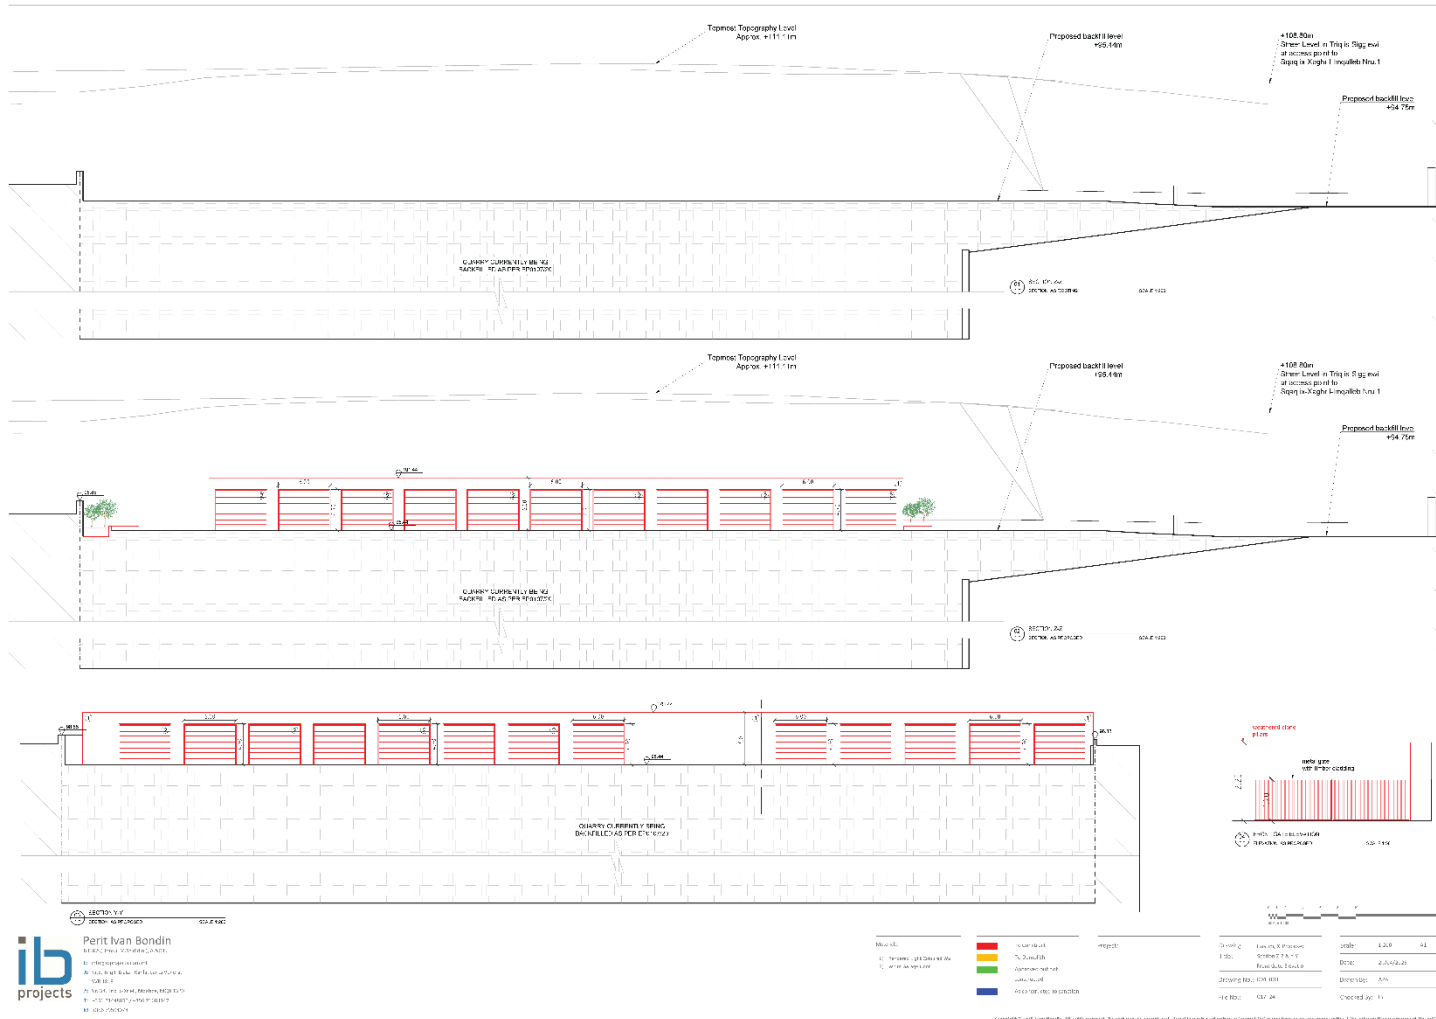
EXISTING AND PROPOSED SECTIONS YY AND ZZ
